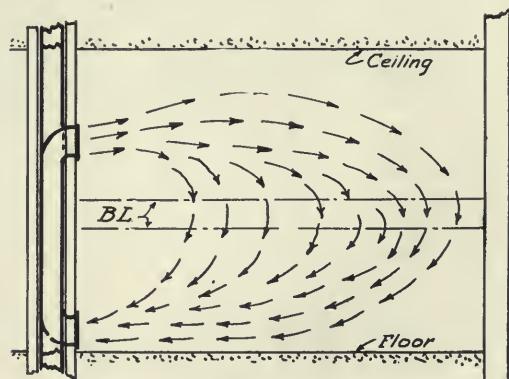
Section of classroom showing effect of locating supply opening above breathing line and exhaust opening at floor line.
